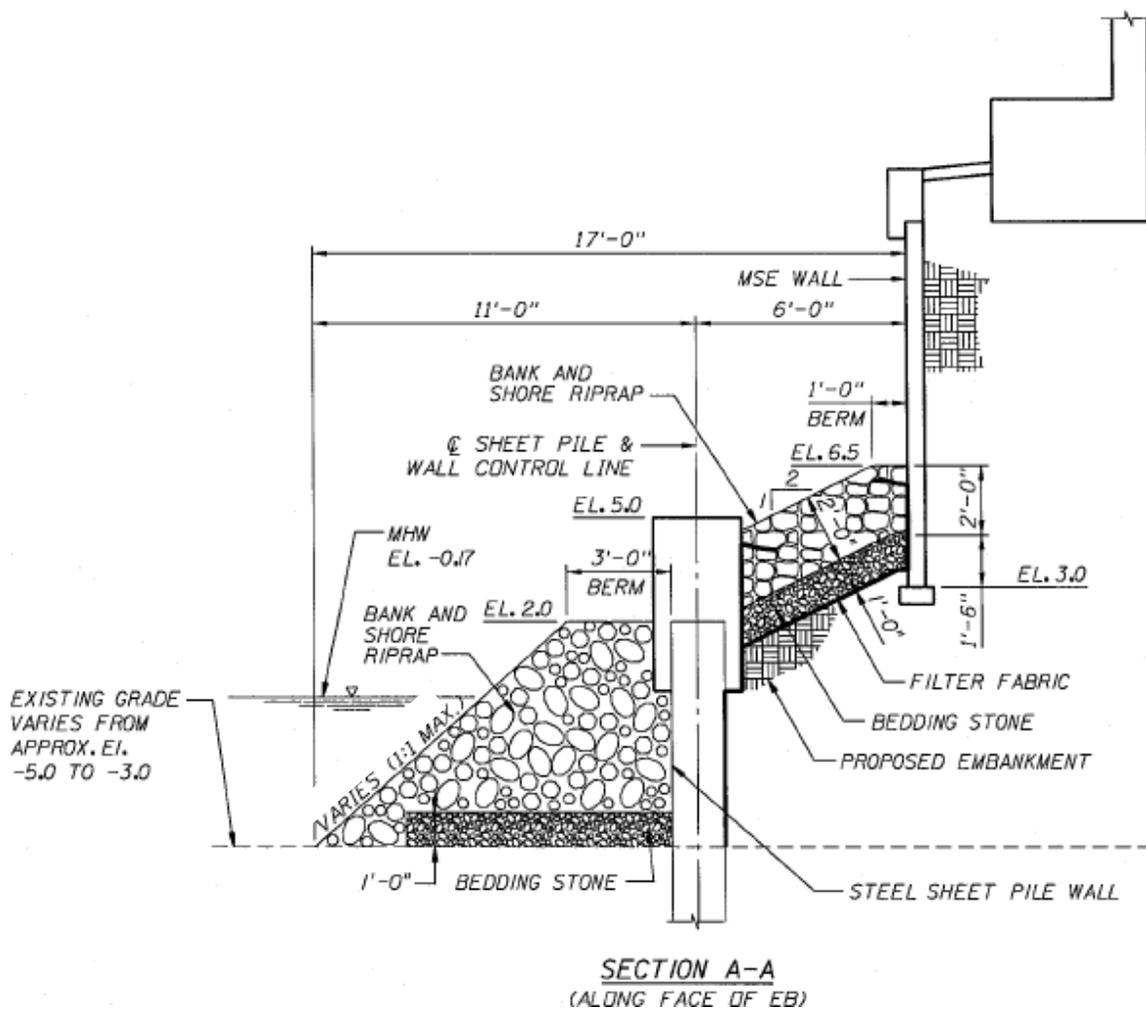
Example of Abutment Protection Design Including a Seawall
